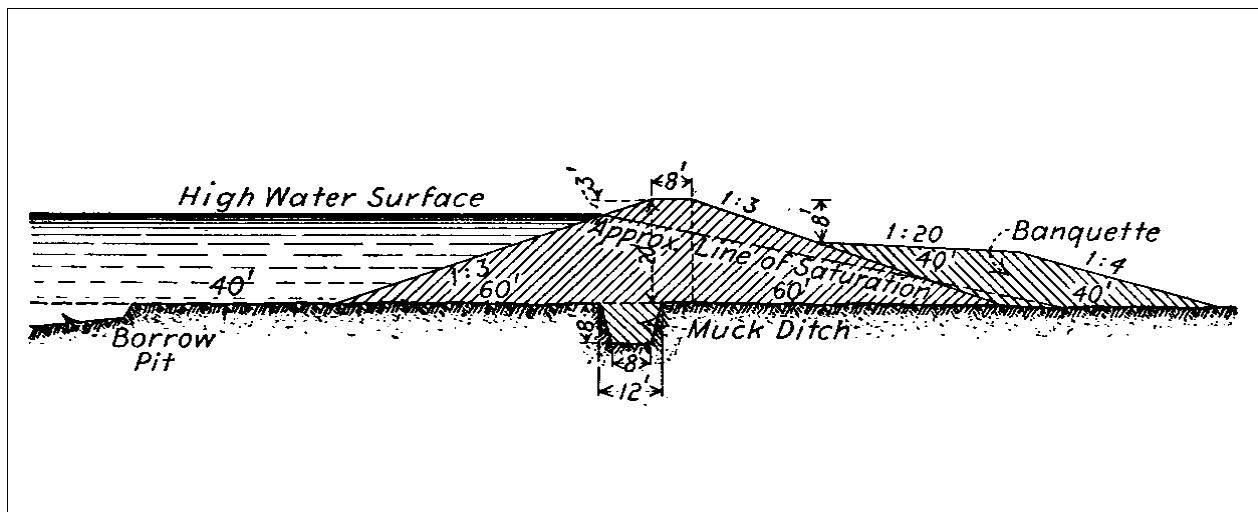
A Typical Levee Section Source: Van Ornum, 1914
